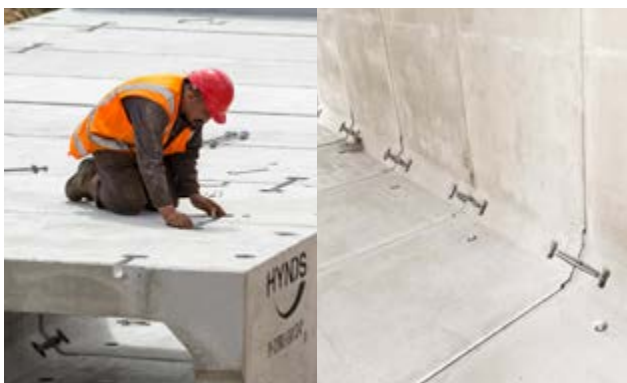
Place threaded rod connecting set in groove. Tighten nuts equally at each end, using a socket wrench to a maximum torque of:
